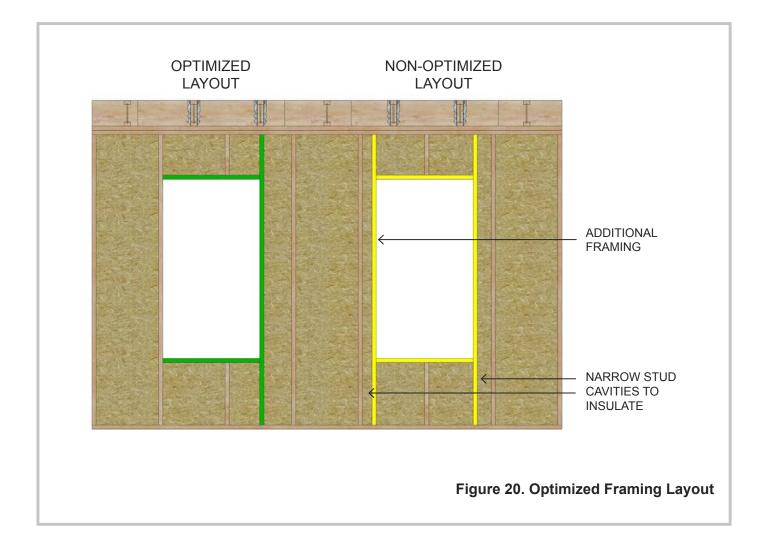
graphically compares a modular placement of windows in a wall with 24 in. on center studs to an "uncoordinated" window placement. Fewer studs are necessary and narrow stud cavities are minimized. Although architectural considerations may not permit the use of the modular layout for every opening, evaluation of window and door placement early in the design phase can help to reduce thermal bridging, improve resource efficiency, and maintain cavity width for insulation.
